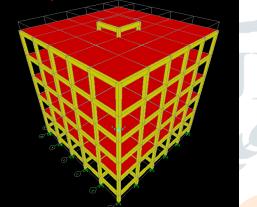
5 Storied Building With Water Tank – 3d View
